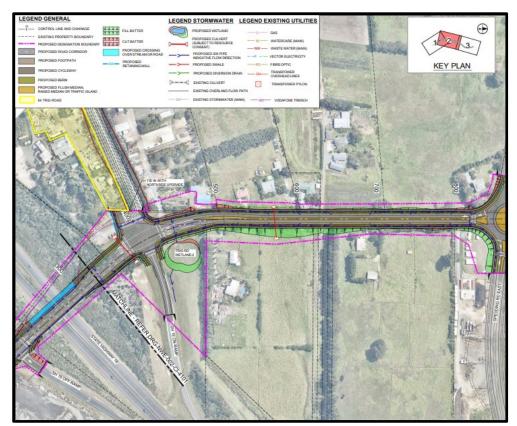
Annotated general arrangement layout plan identifying 64 Trig Road in yellow
